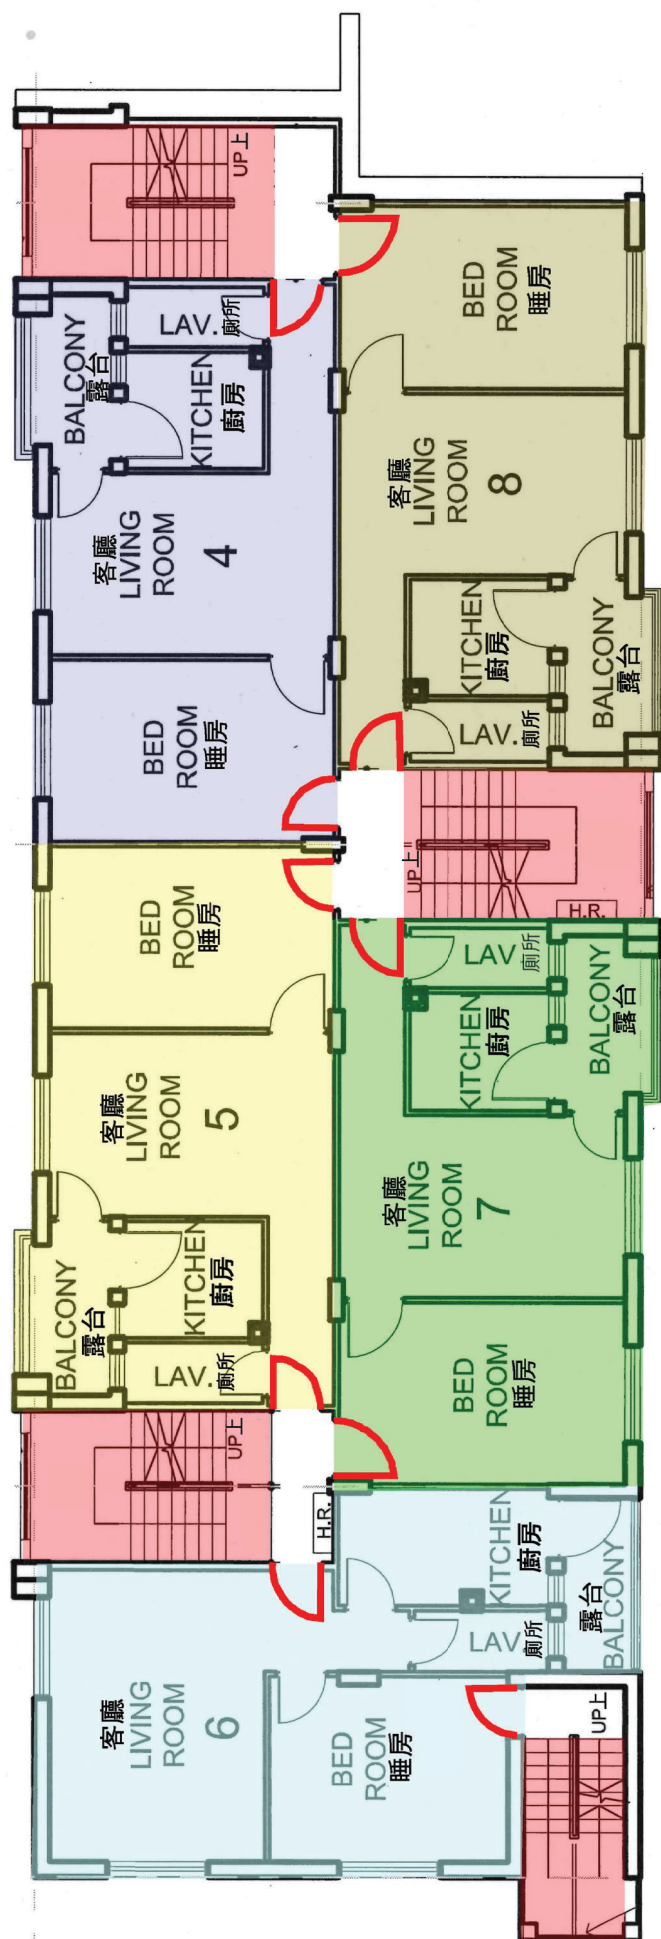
TYPICAL FLOOR PLAN FOR LOW BLOCKS
